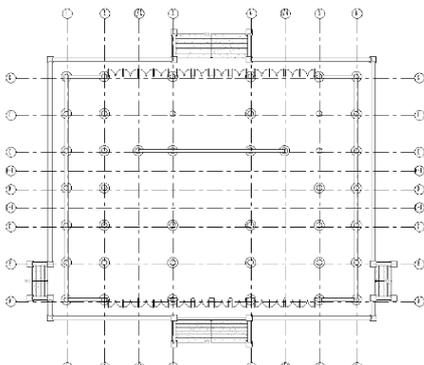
Ground floor plan. Figure 15: Panoramic map of the Mahavira Hall.
